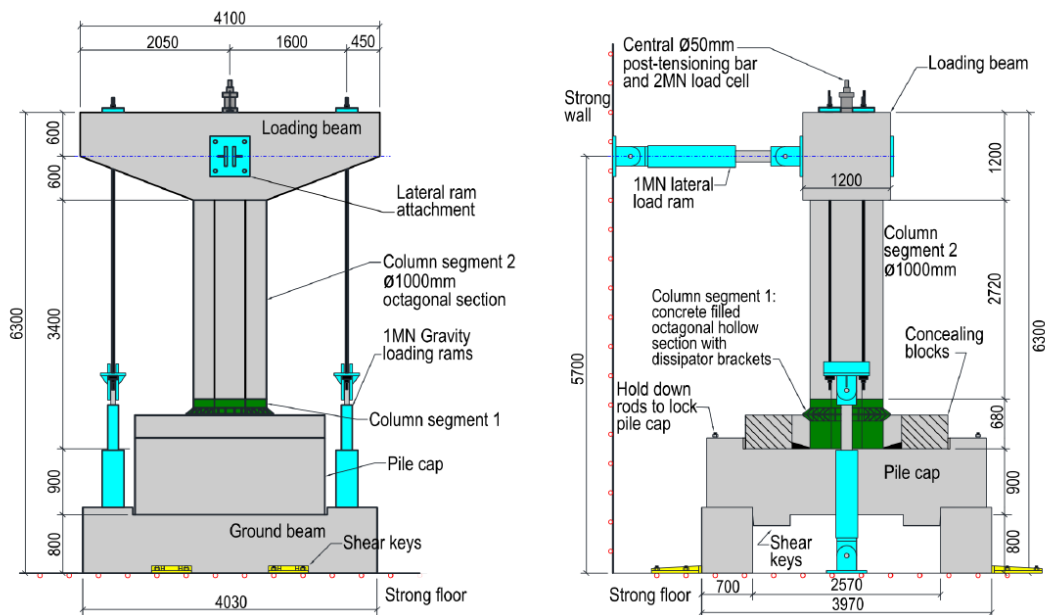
Schematic of the specimen testing arrangement (Liu, 2018)
